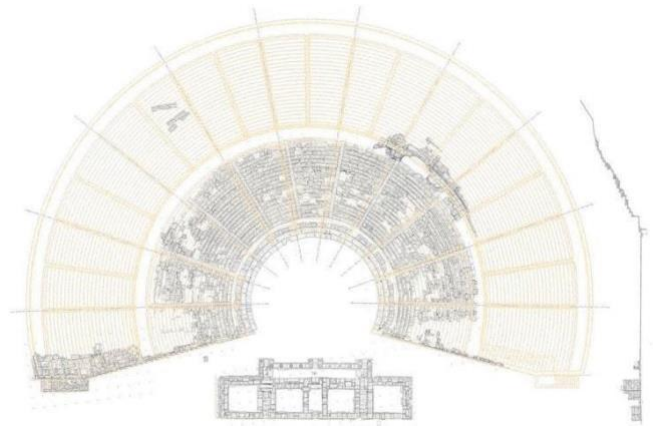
Plan & Section of the A' Theatre of Larissa.
